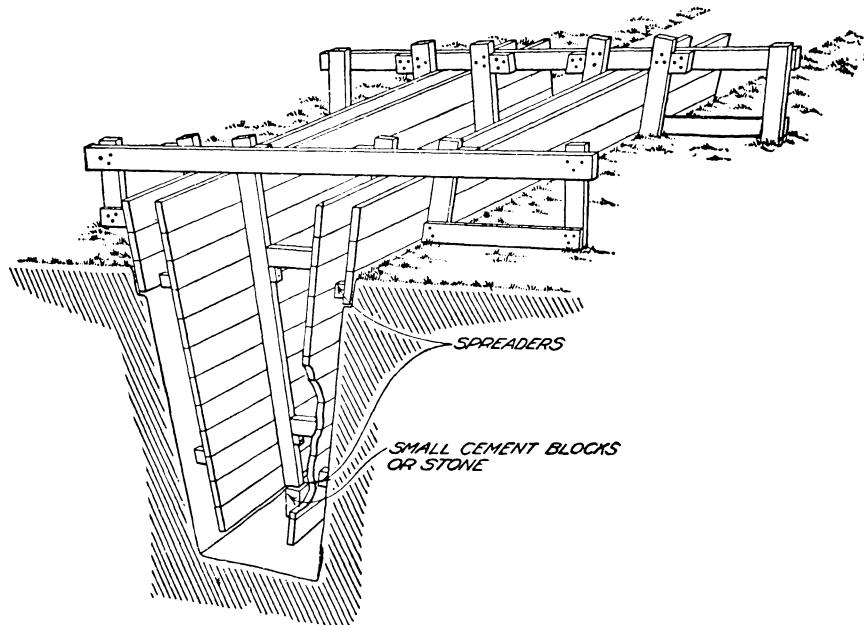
Section of trench for concrete vat with sloping sides, showing the forms in place and one method of bracing.
